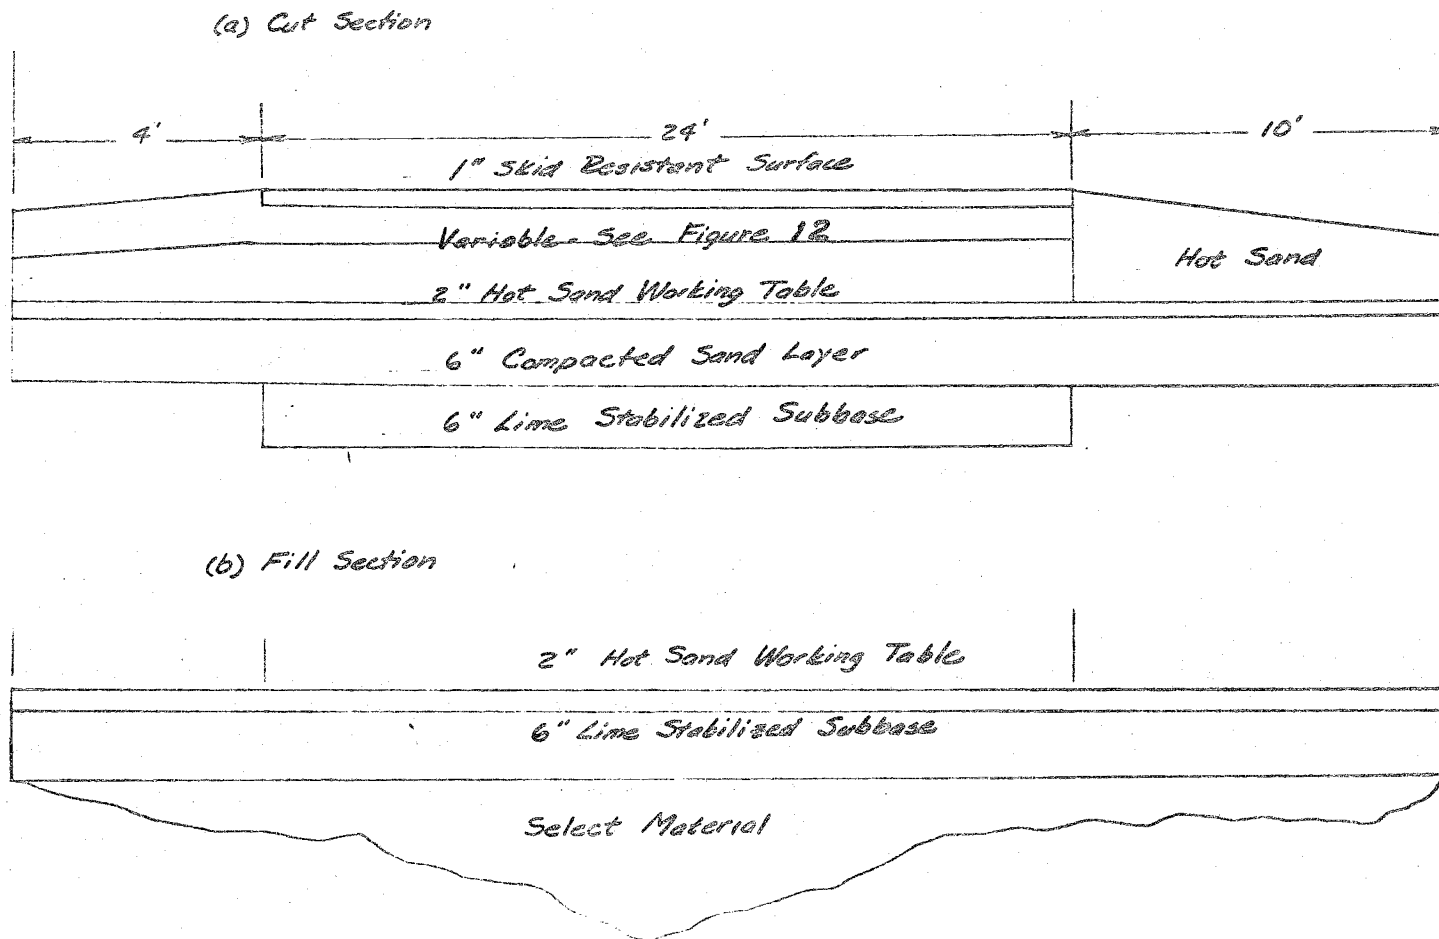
Typical Sulphur-Bitumen Test Section Cross Sections
